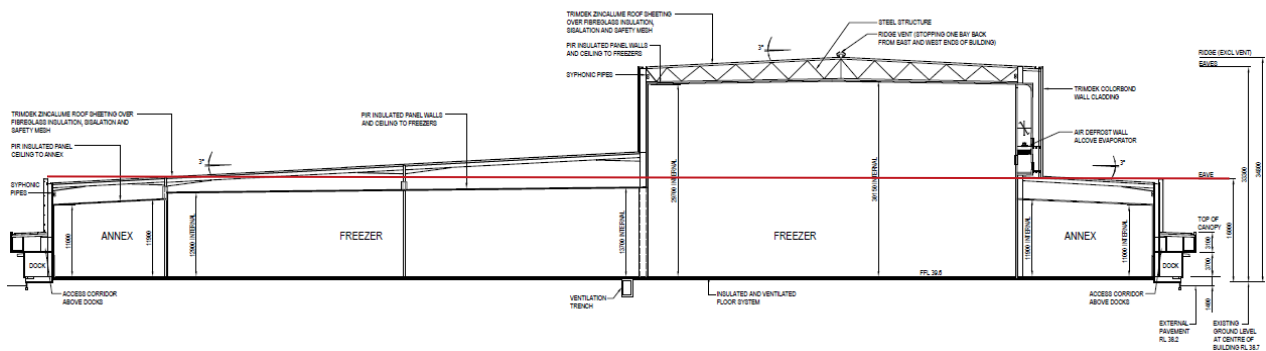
West elevation of the proposal (SEPP Height limit shown in red)
